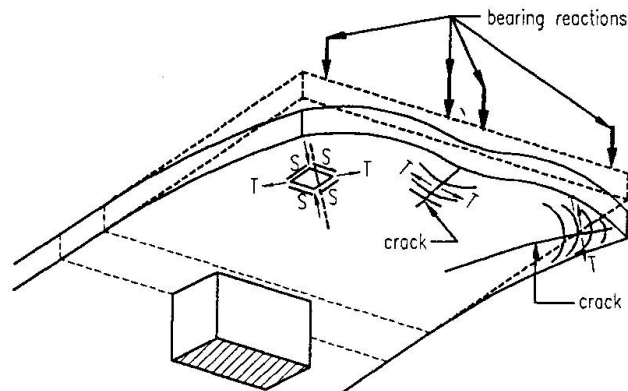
Cracks Caused by Principal Stress of Bearing Reactions
